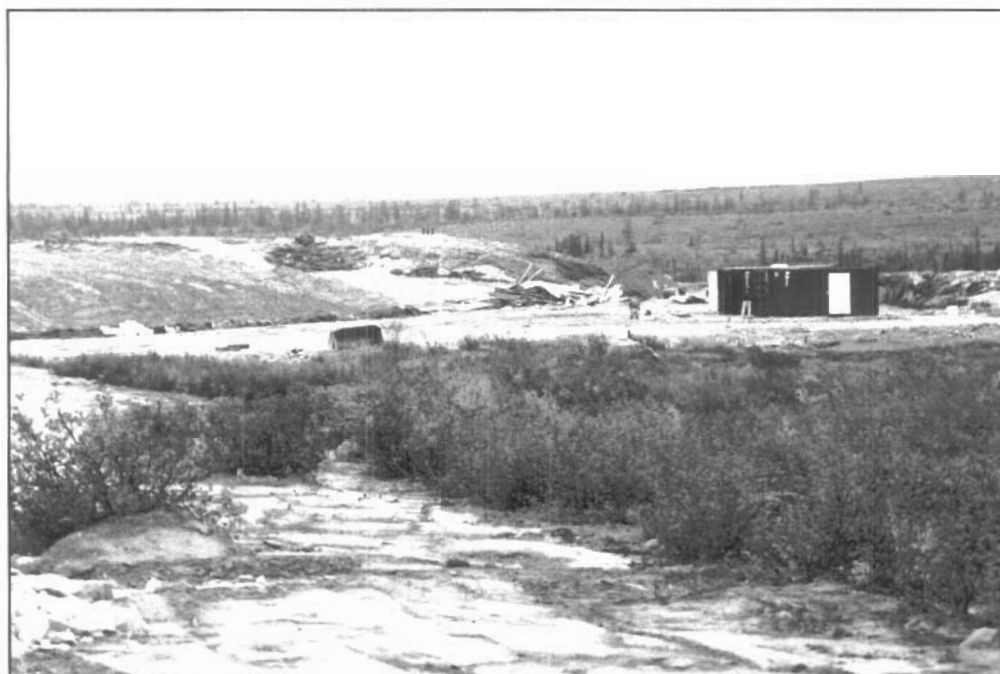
Ground view of waste rock pile under construction. Area in foreground is part of the original waste rock pile. View looking northwest.
